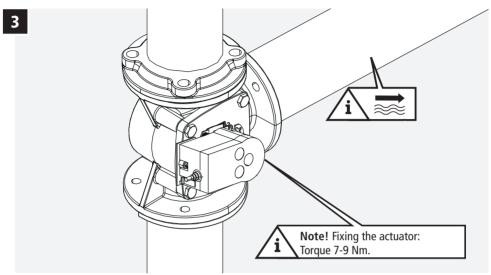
Fixing the actuator: Torque 7-9 Nm.
